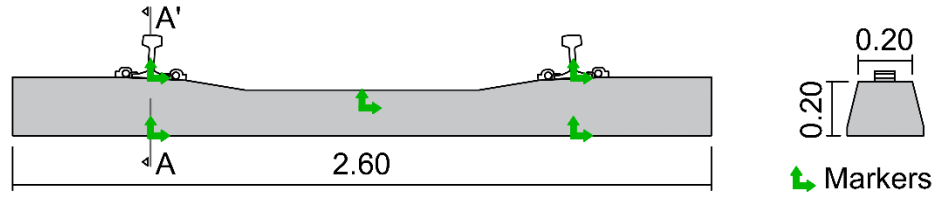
Scheme of concrete sleeper type G44 (m).
